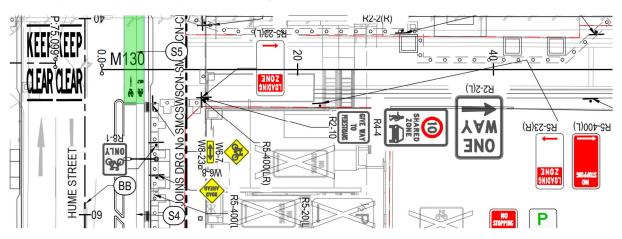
Lay-by Loading Zone in Clarke Lane for Site C waste collection, deliveries and loading.
